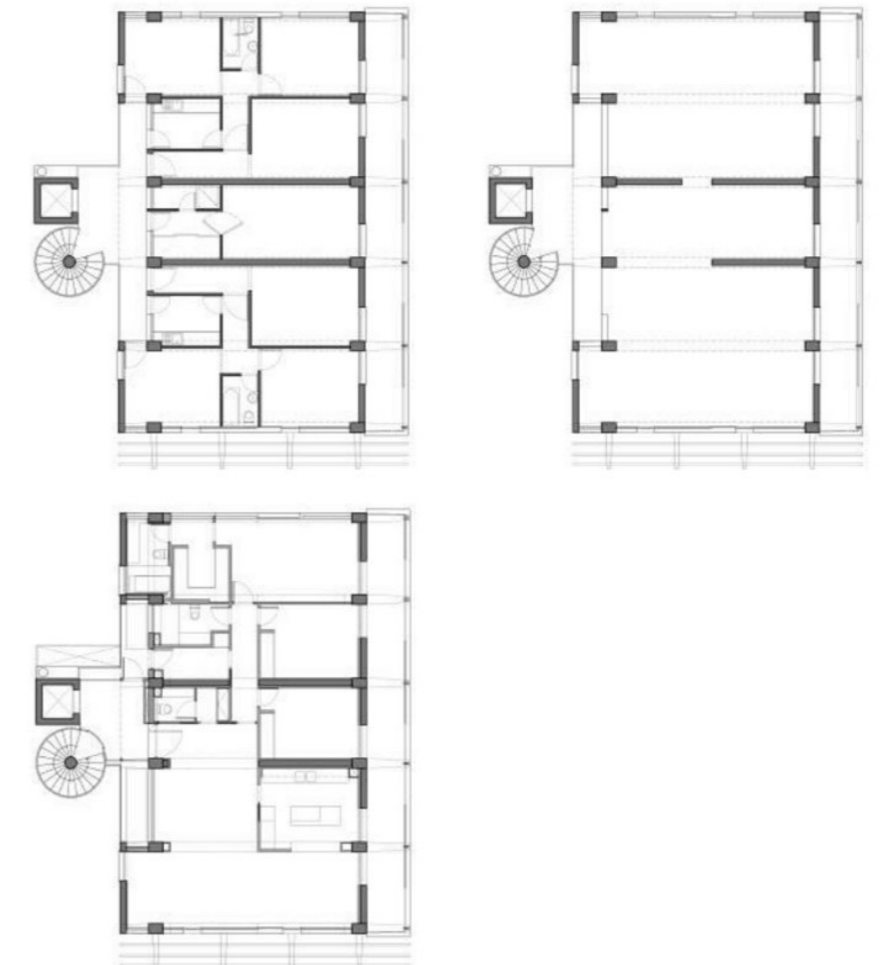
Current situation plan, Demolition plan & Intervention plan. © A. Michael's archive.
